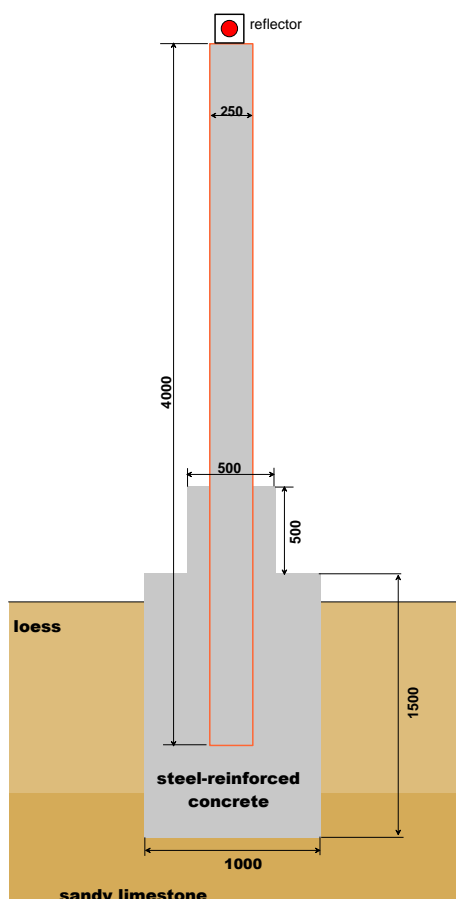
Steel-reinforced concrete pillar to support laser reflector
